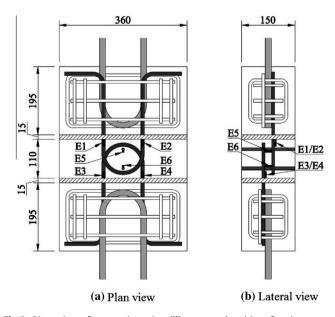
Dimensions of test specimen, in millimetres, and position of strain gauges at the connection.
